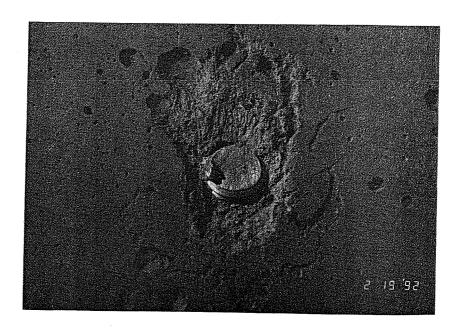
Crushing of grout around anchor bolt - Test 2-CG3T-SS
